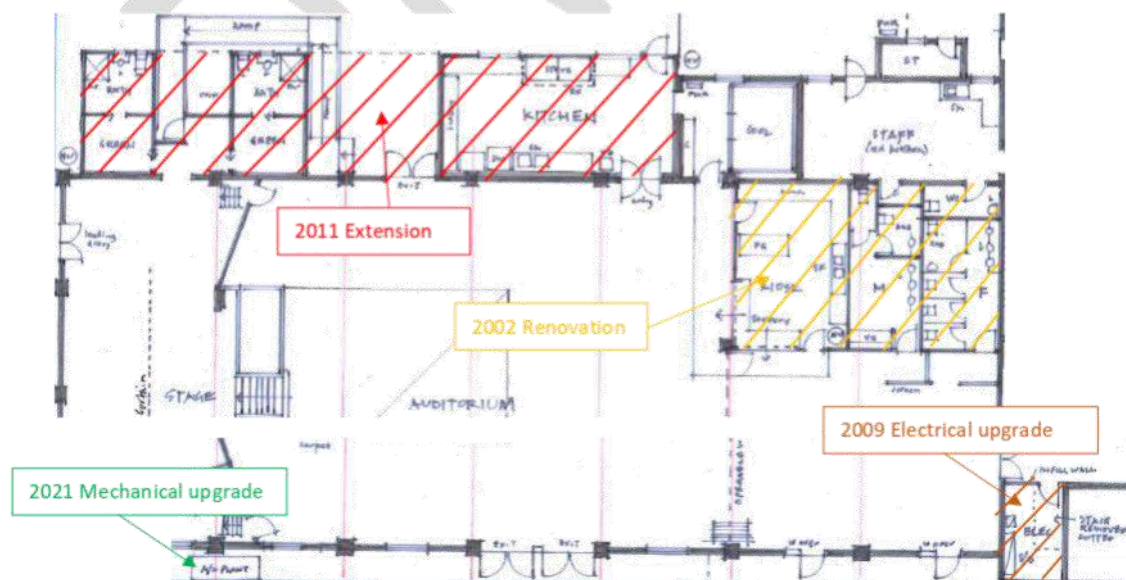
Theatre Royal building - Ground First Floor Plan extract - Noel Thomson Architecture
